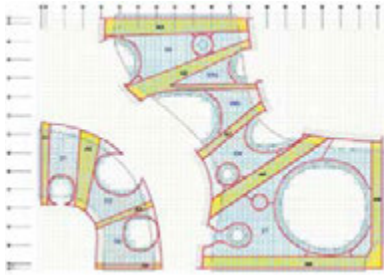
yellow 11 arches with reinforcement in red formwork in blue (Grohmann 2008)
